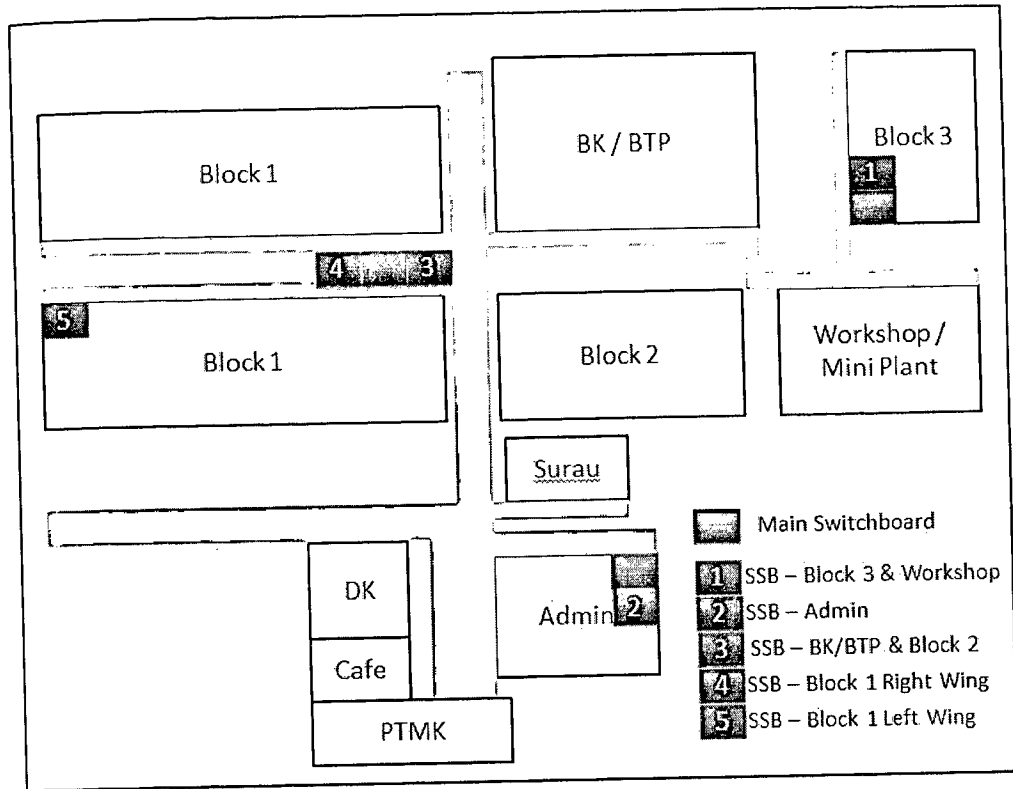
Layout of Electrical Sub Switch Board in FKKE
